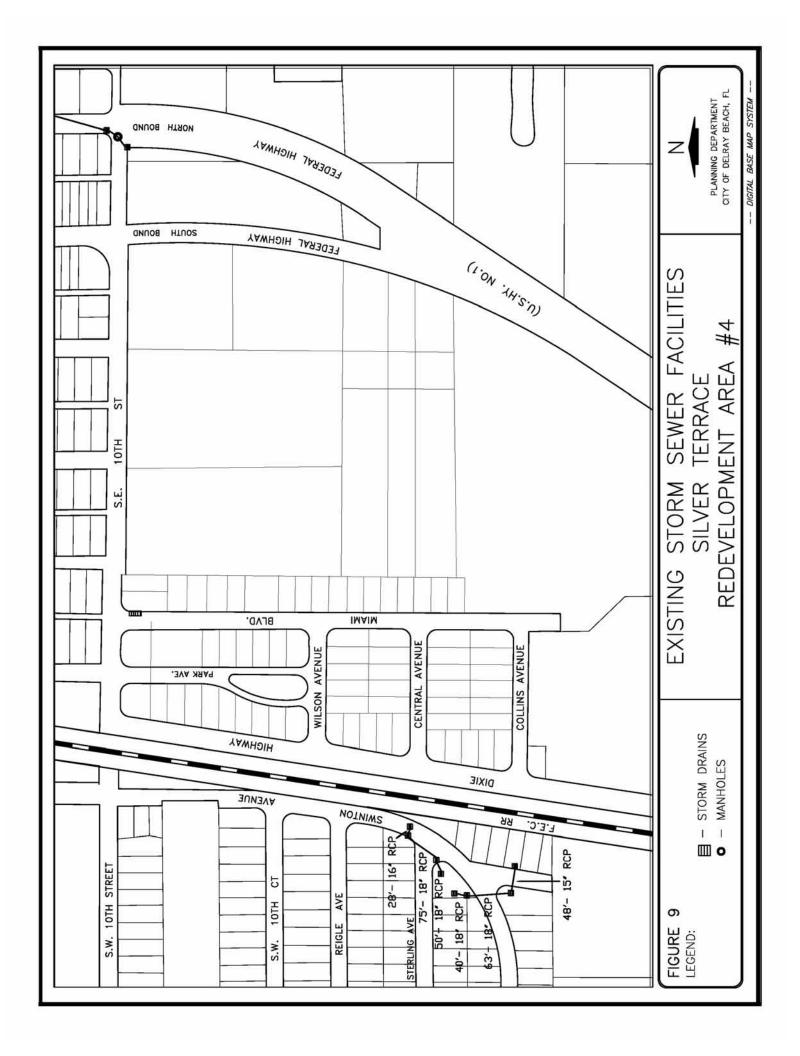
(Page 31) depicts existing storm sewer facilities in the area.
